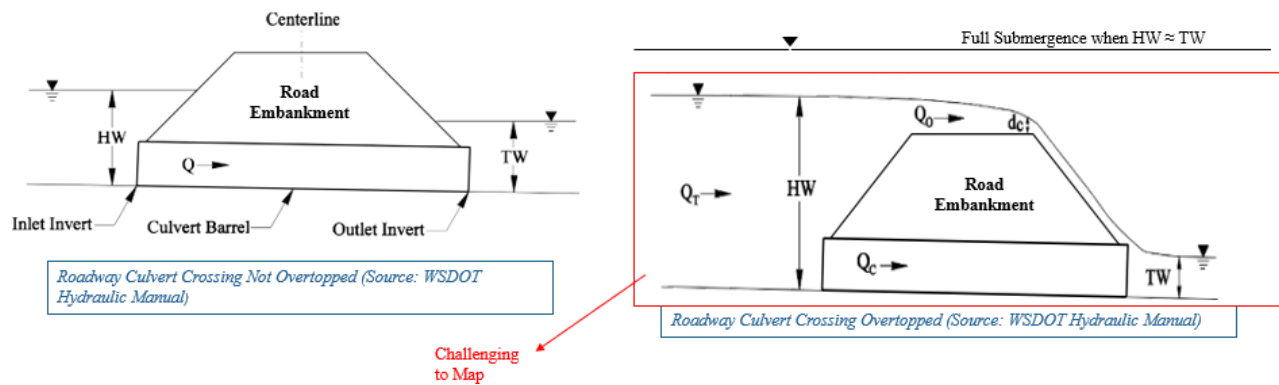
Submerged culvert hydraulics without and with road overtopping (Source: WSDOT, 2025)
